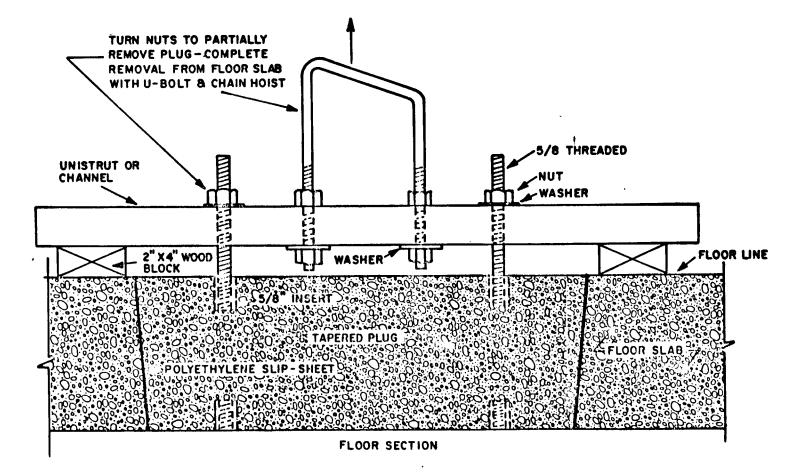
Method of Removing The Precast Concrete Plug for Cable Holes Between Columns
